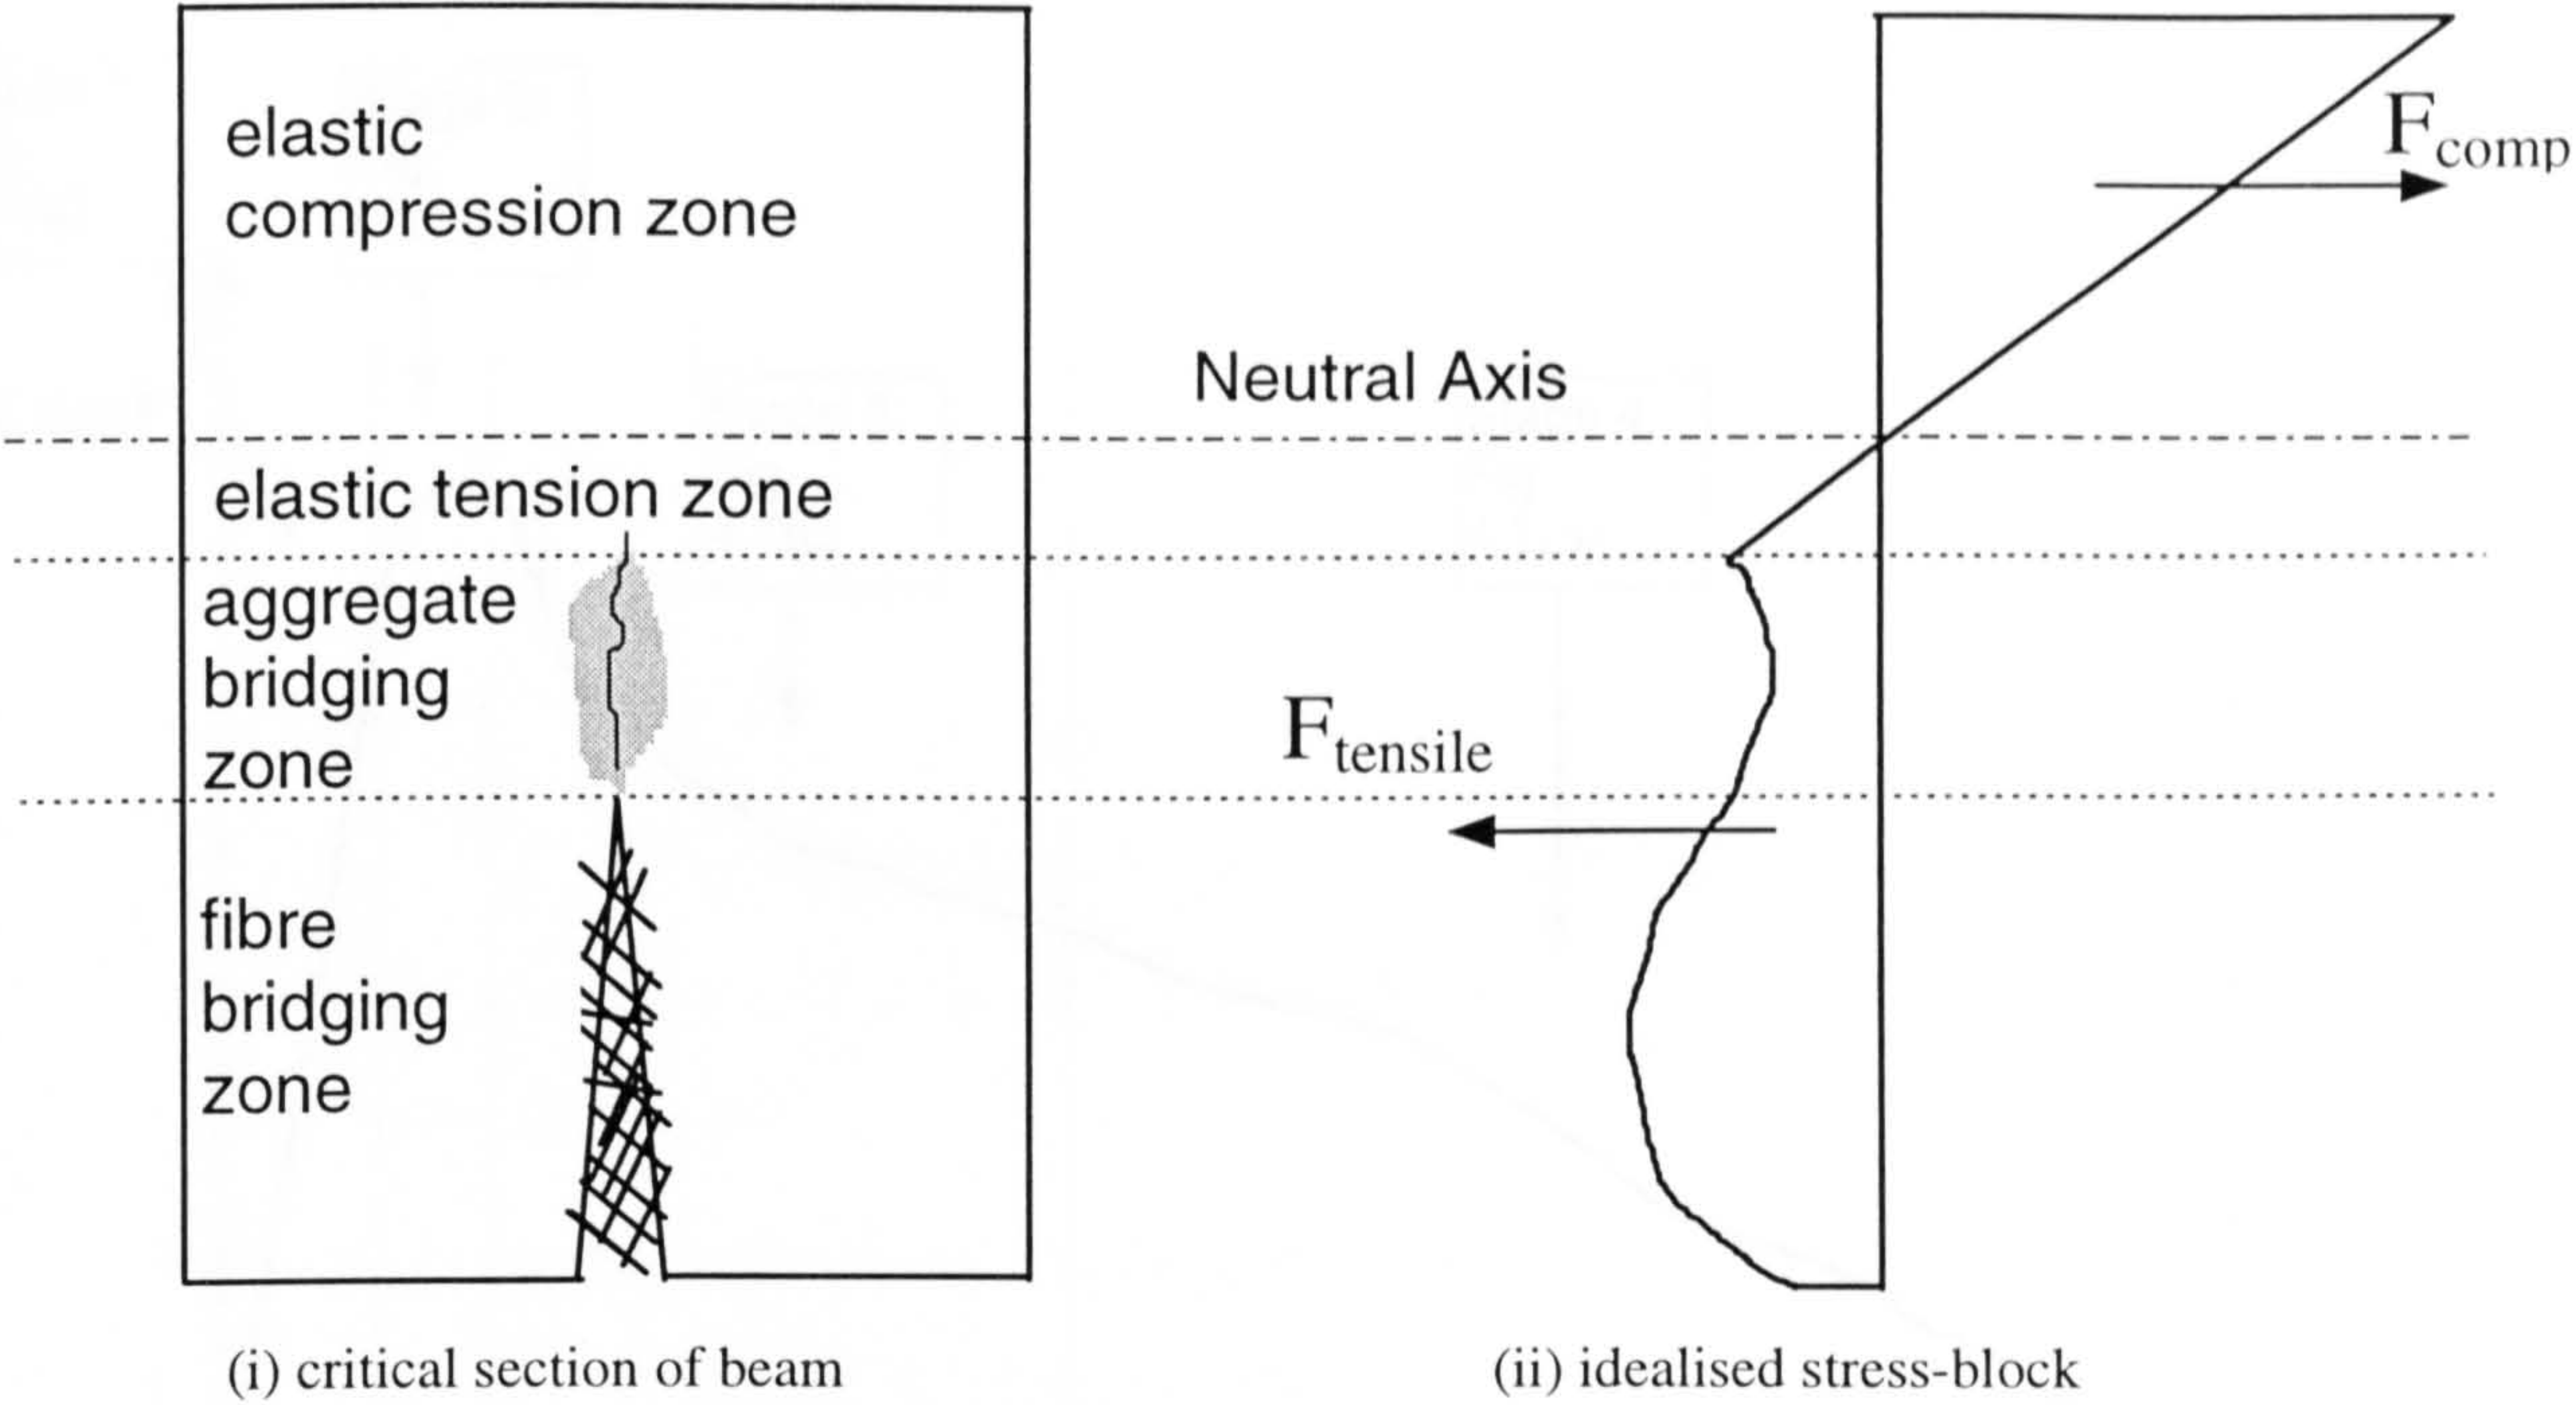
(c) Schematic representation of a steel fibre reinforced concrete beam under flexural loading: Stage 3 - development of macro-crack.
